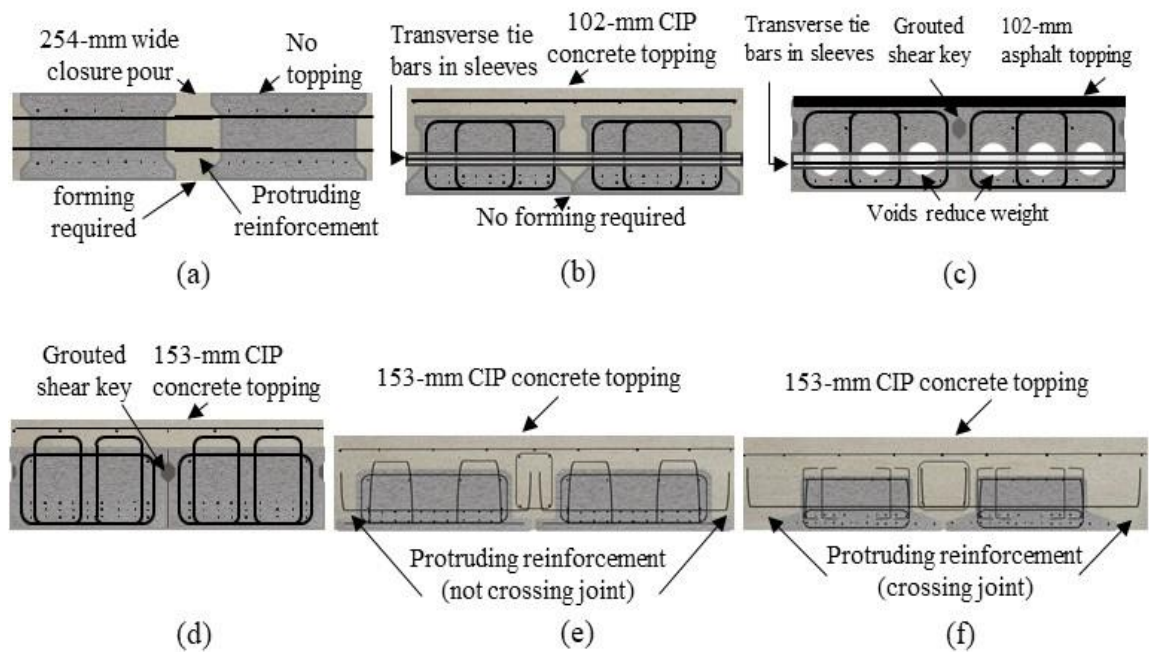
Slab beam system evolution in Florida: (a) prestressed rectangular slab unit (1955), (b) prestressed keyed slab unit (1958), (c) prestressed voided slab units – Sonovoid (1958), (d)
